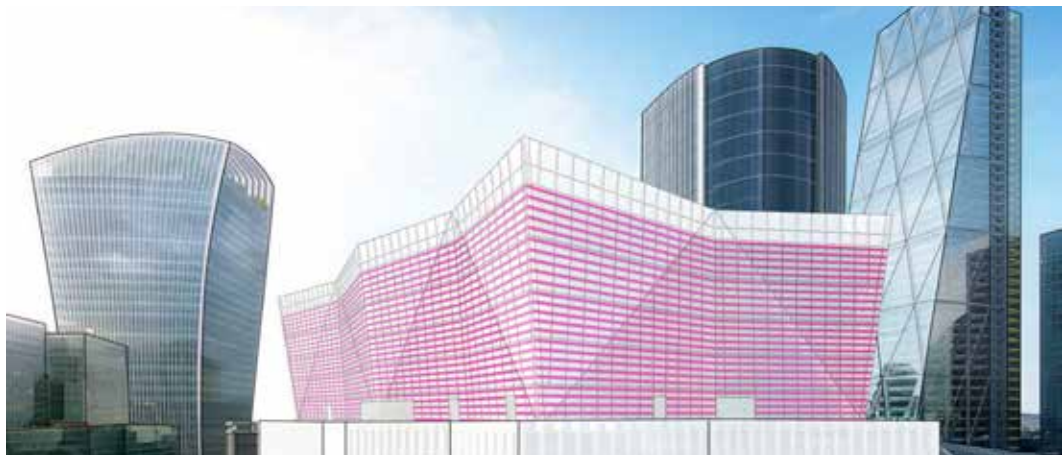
Schematic Rendering of the Fenchurch Avenue 10 “crown” façade in London designed by Eric Parry Architects.
